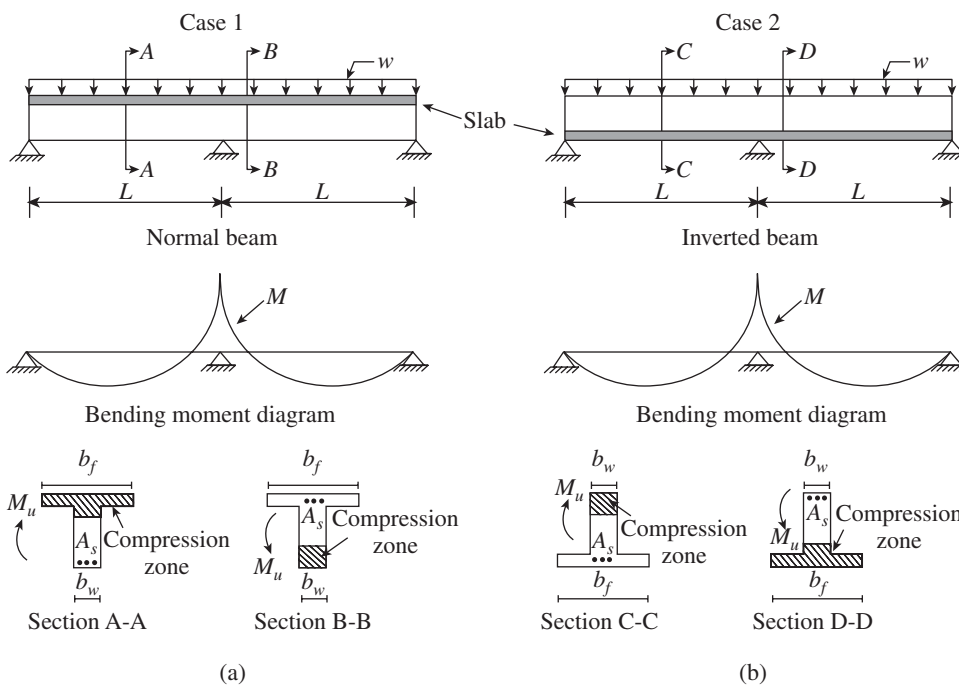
Compression zones (a) Normal beams (b) Inverted beams
